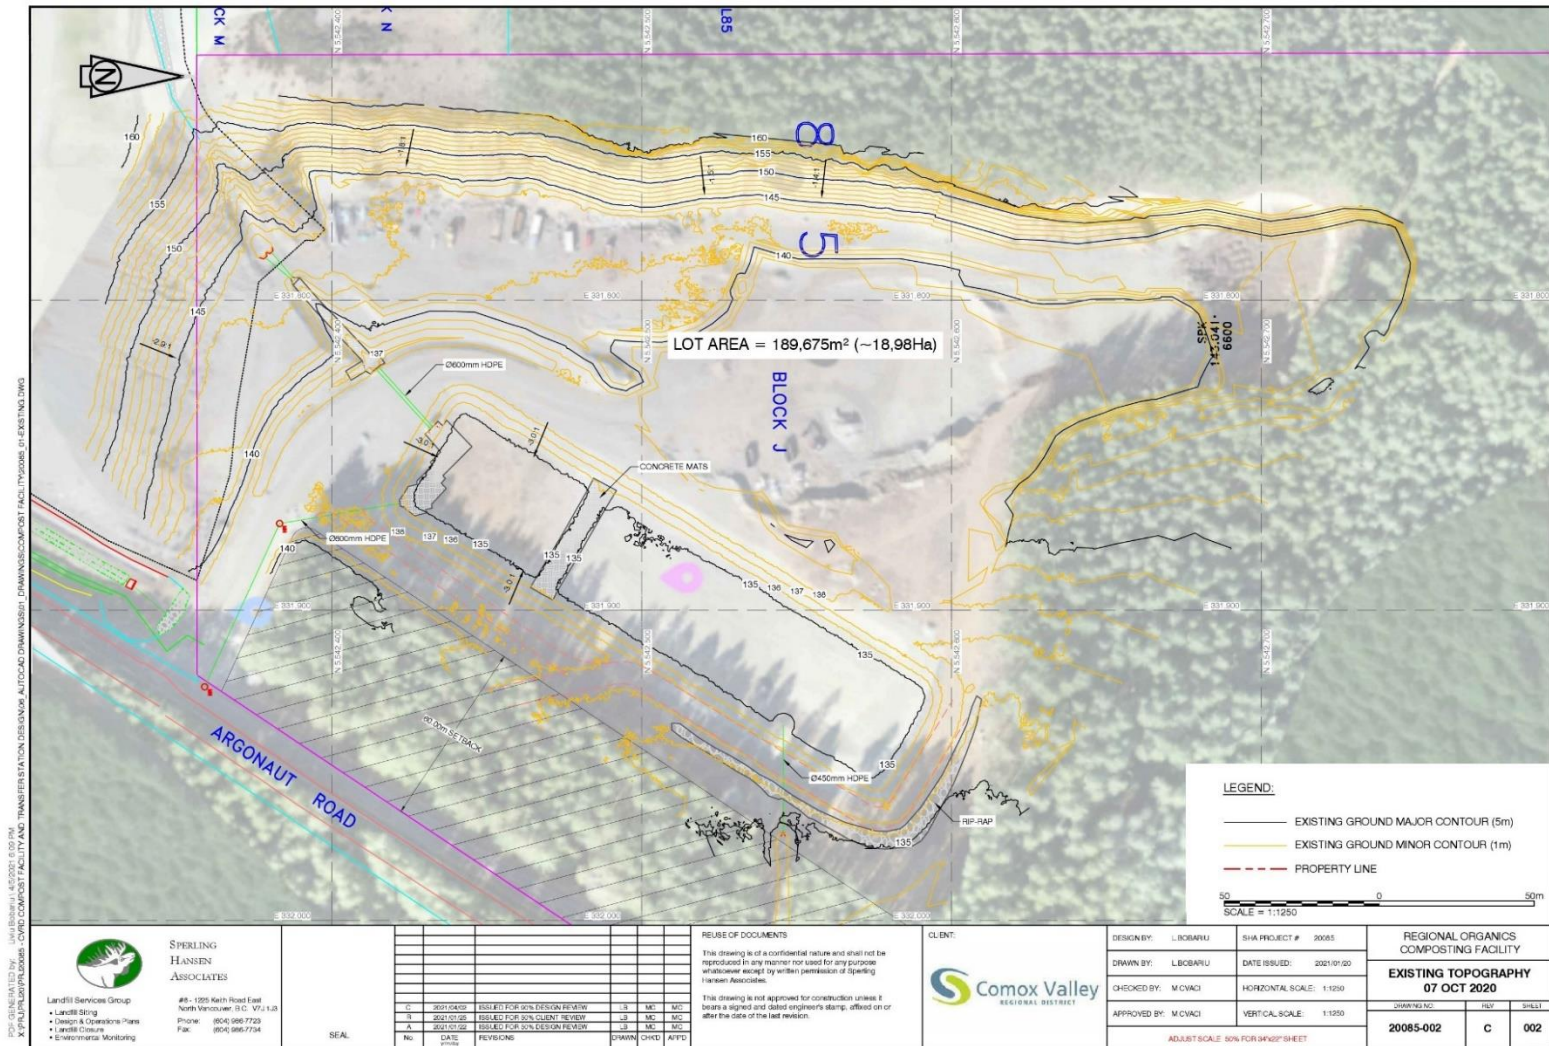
Existing topography for the proposed development site at 6300 Argonaut Road, Campbell, River.
